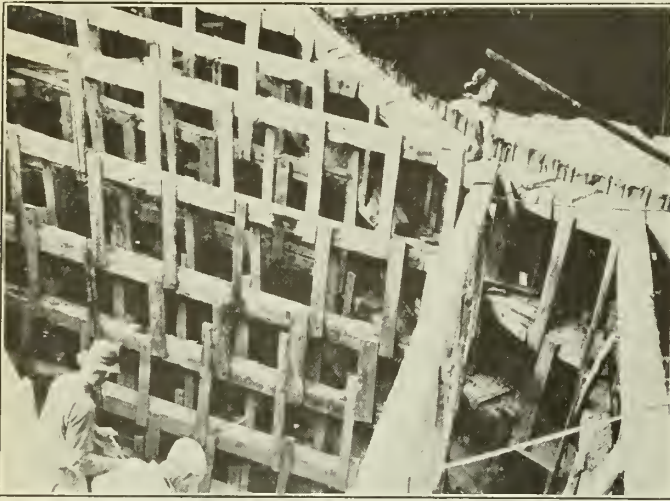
View showing Settlement of Sheet Piling in West Wall of Pit H, August, 1927.
